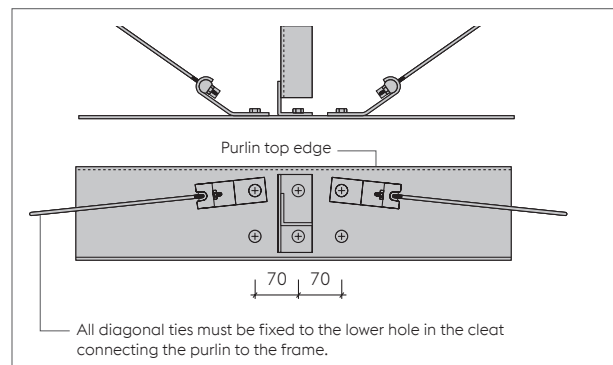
Detail of joining a strut and a diagonal tie to the purlin in an inner braced bay
